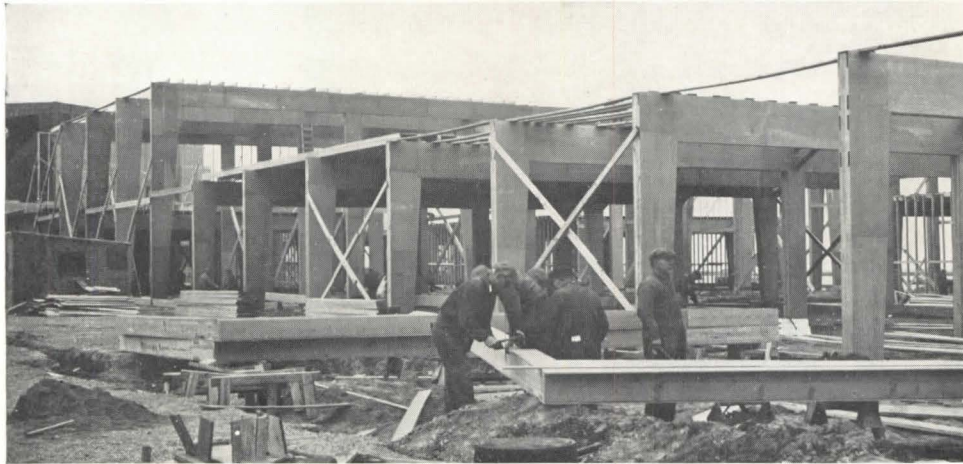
Plywood nailed to a rigid frame forms extremely strong, lightweight members.
